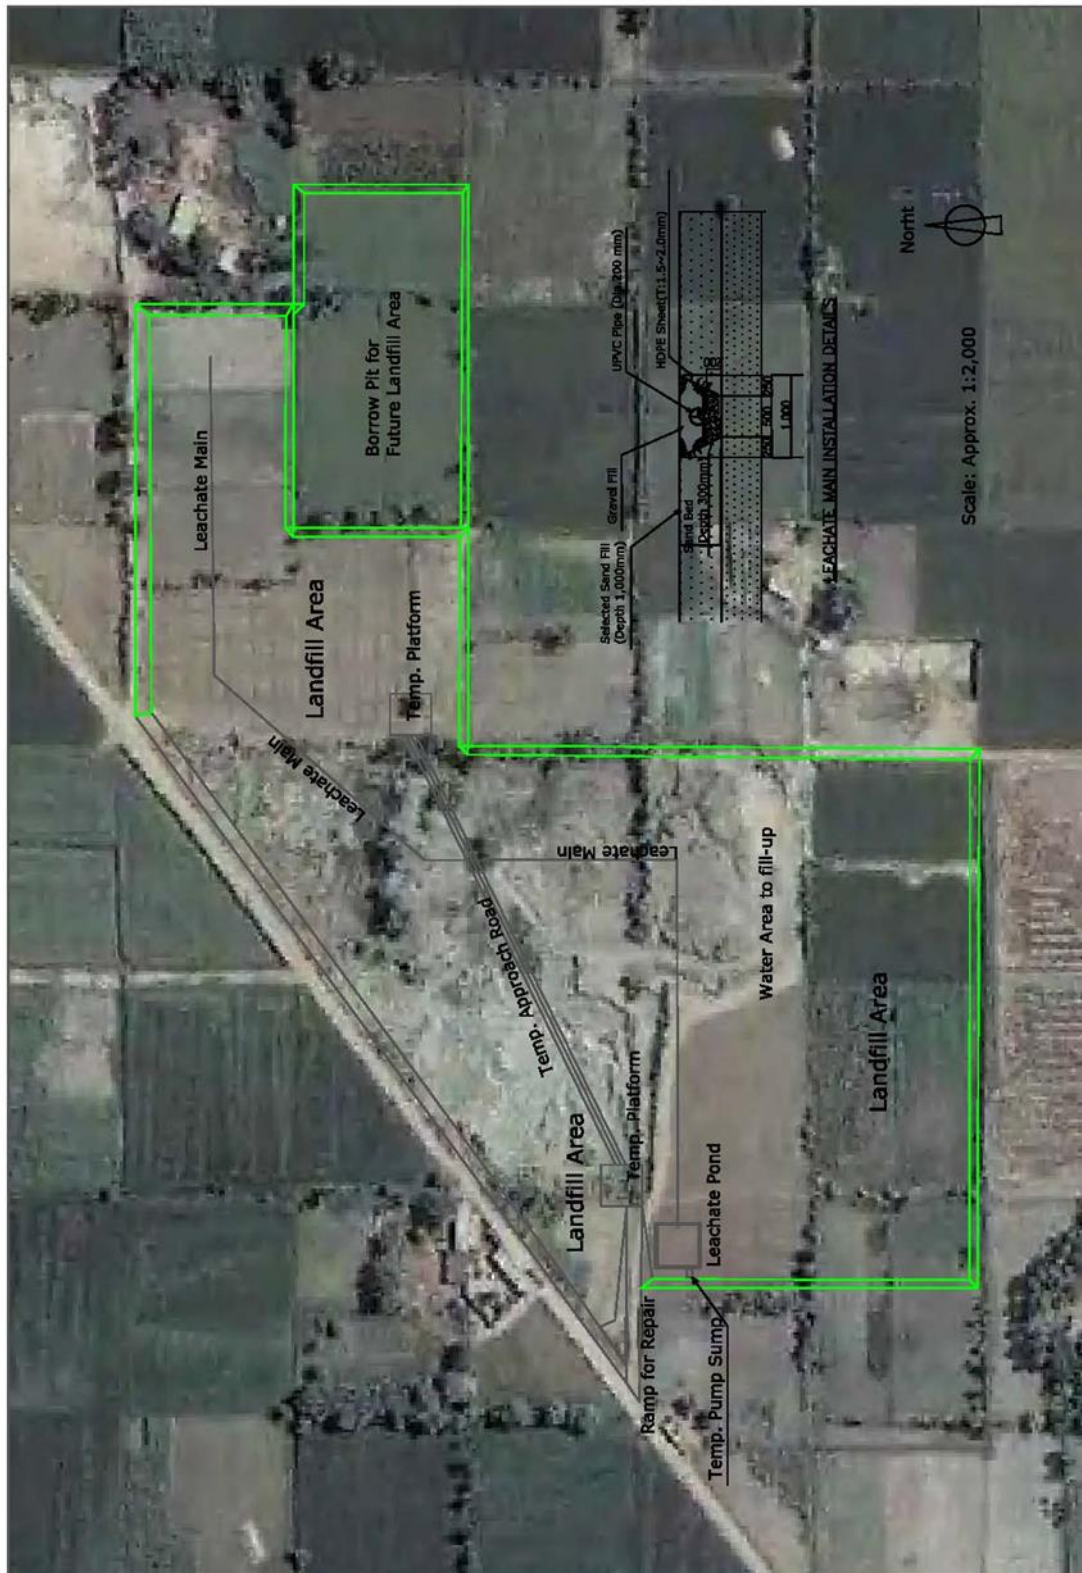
Urgent Improvement Plan for Gondlanwala Landfill Site
